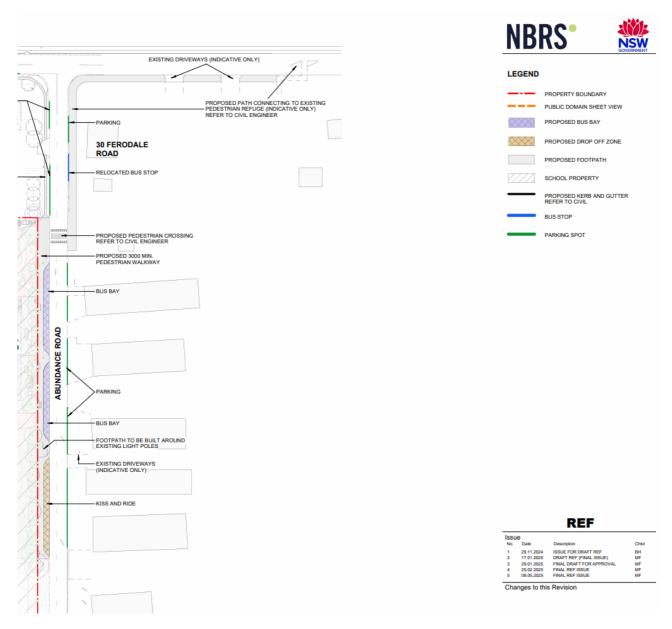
Extract of Public Domain Plan works - Abundance Road (Source: NBRS)
